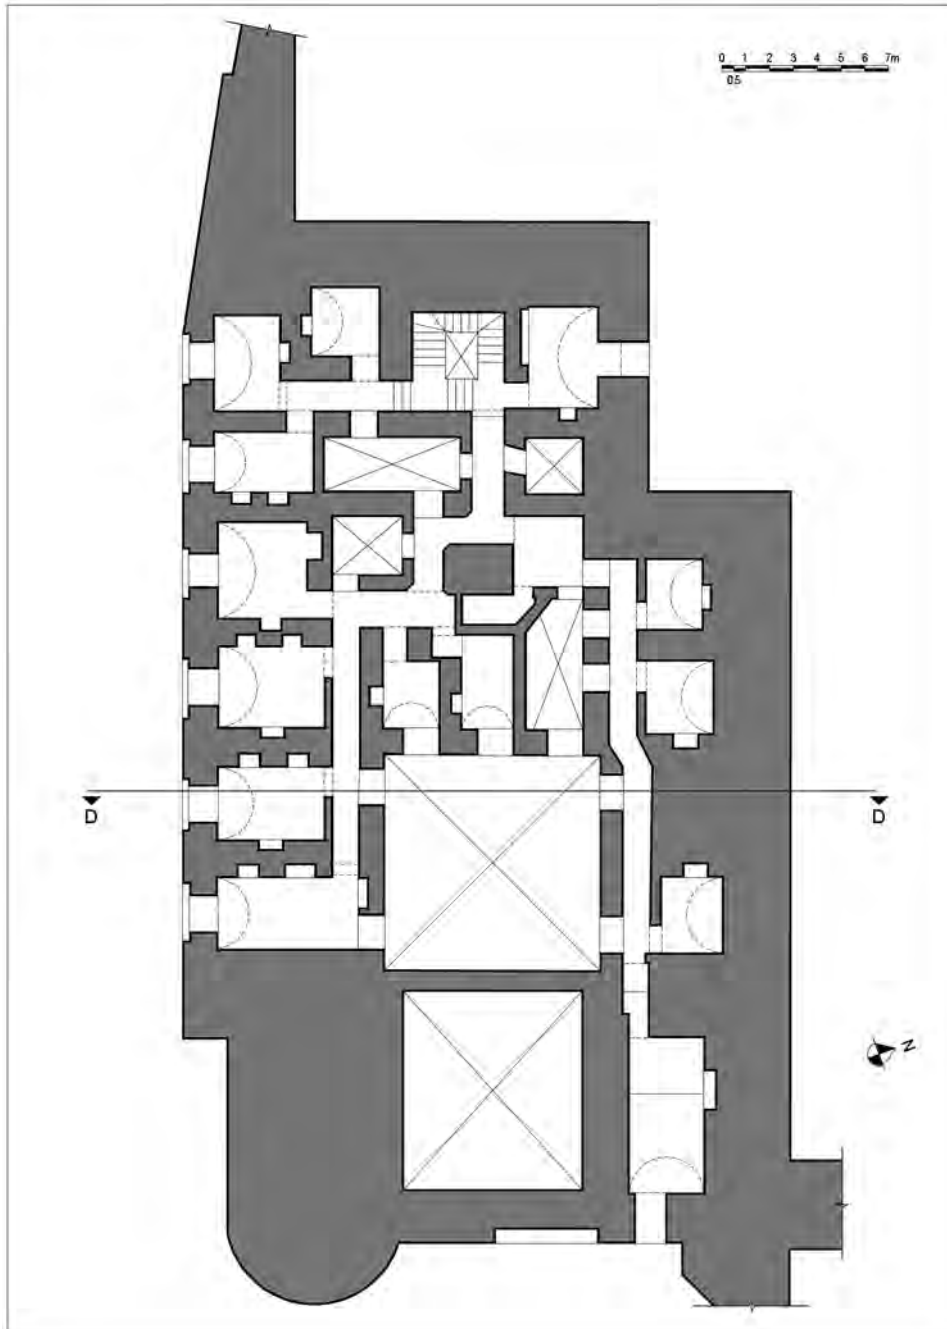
Ḥanafiyyah Madrasah, Complex of Sultan Ḥasan, Cairo, fourth floor plan (H. Al-Harithy)
